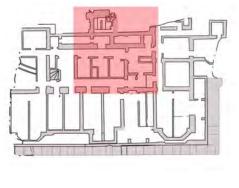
Aerial view, location plan of Rooms B12, B13, B14, B21, B22, C1, C2 Showing key contexts.
